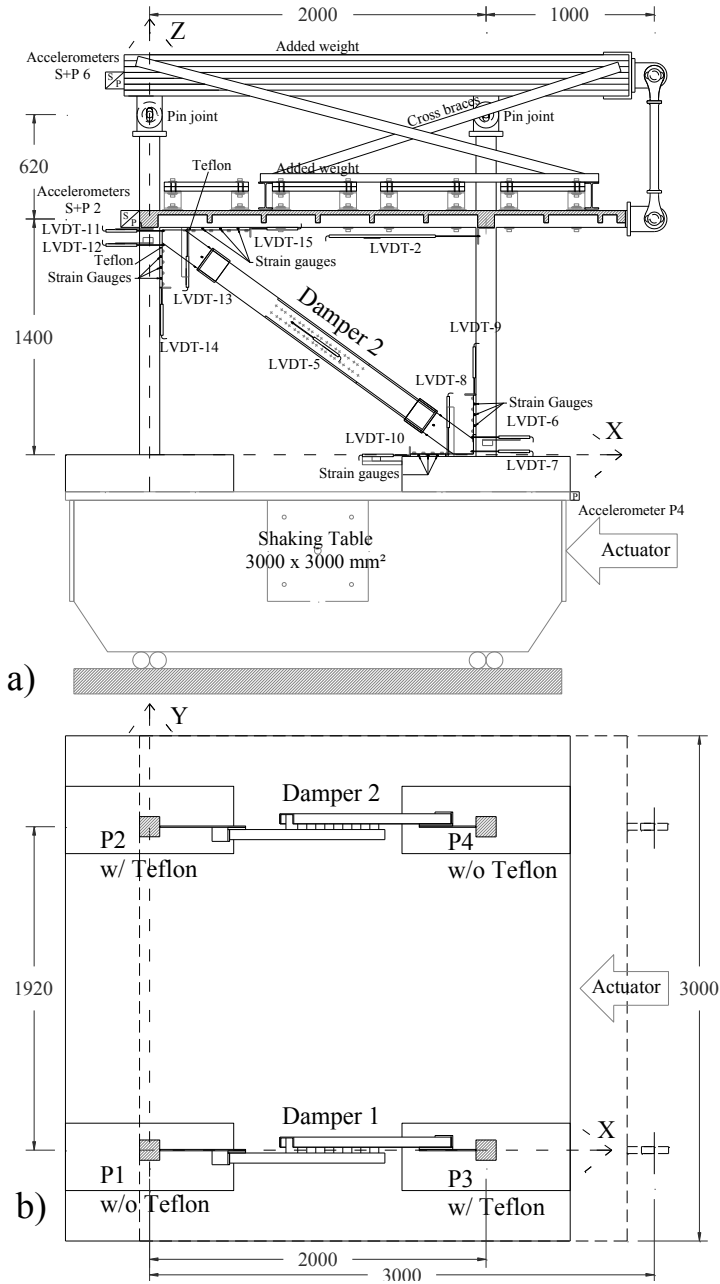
Test structure; set-up and instrumentation (units: mm): a) elevation; b) plan
